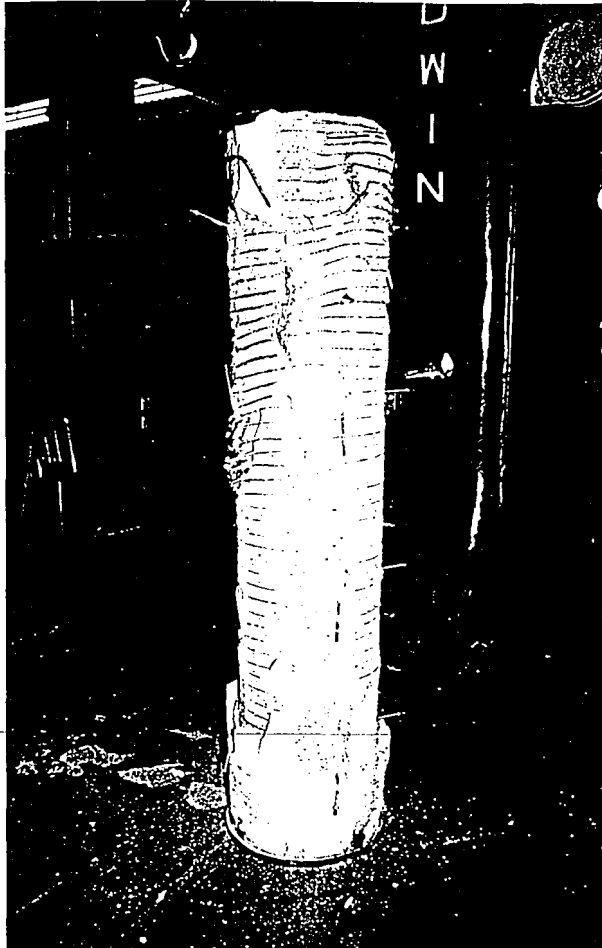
(j) Specimen M3-series of key photographs; (j) post-test photograph showing the inclined failure plane.
